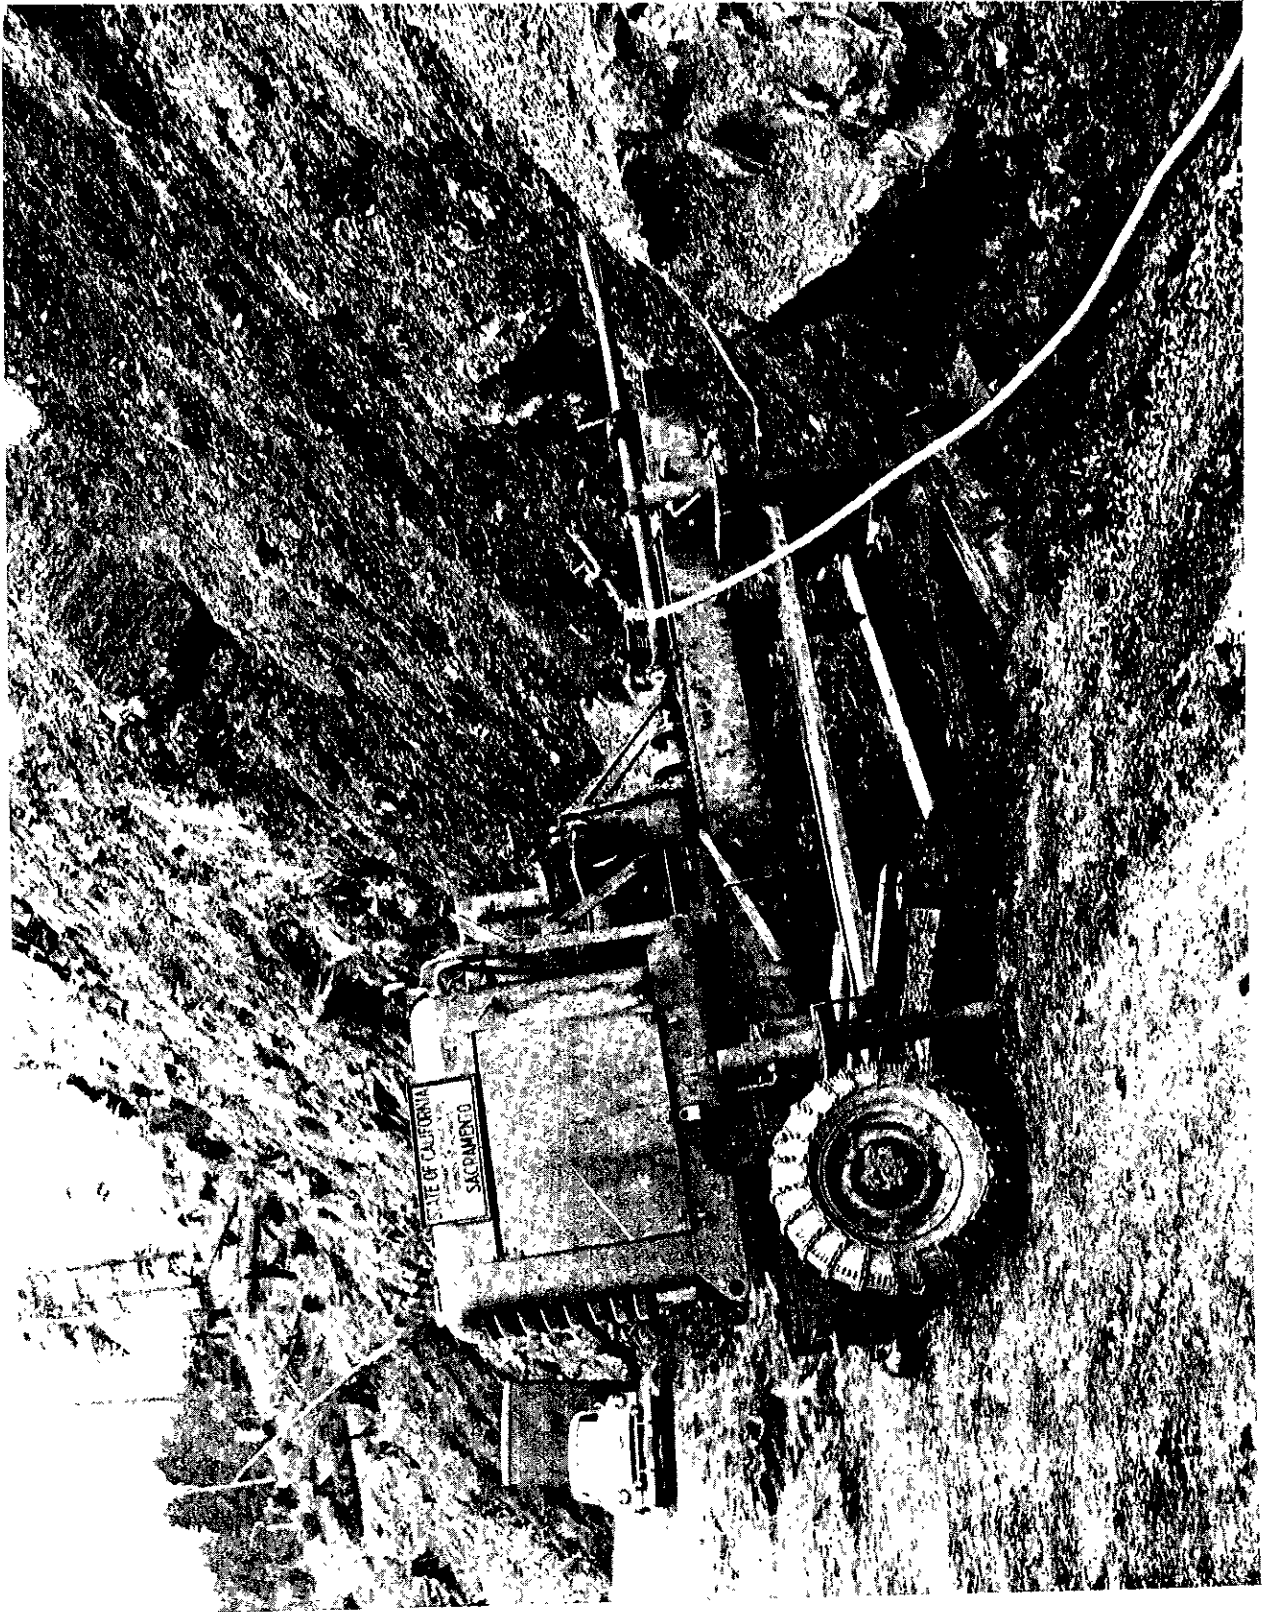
McCarthy Rock Boring Machine modified to drill with circulating fluid.
